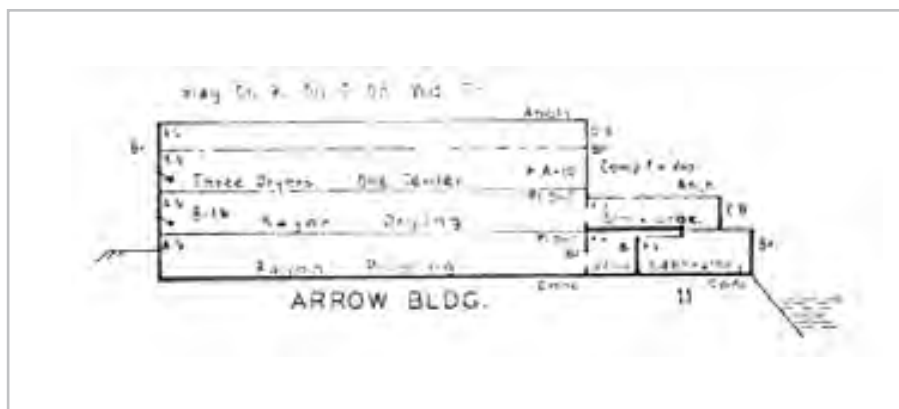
Factory Mutual Insurance Co. *Mill Realty Co.* 1965. South-north cross-section through the Arrow Building and Building 11. Scale: 1 inch= 30 feet (approximately).
